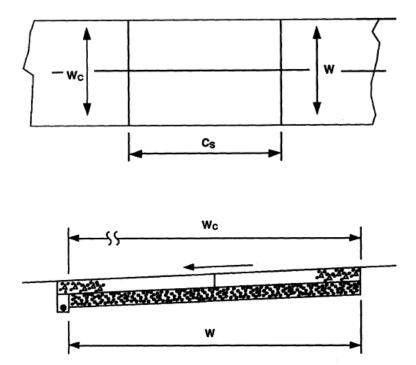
Plan and sectional view of a concrete pavement (FHWA, 1993).
